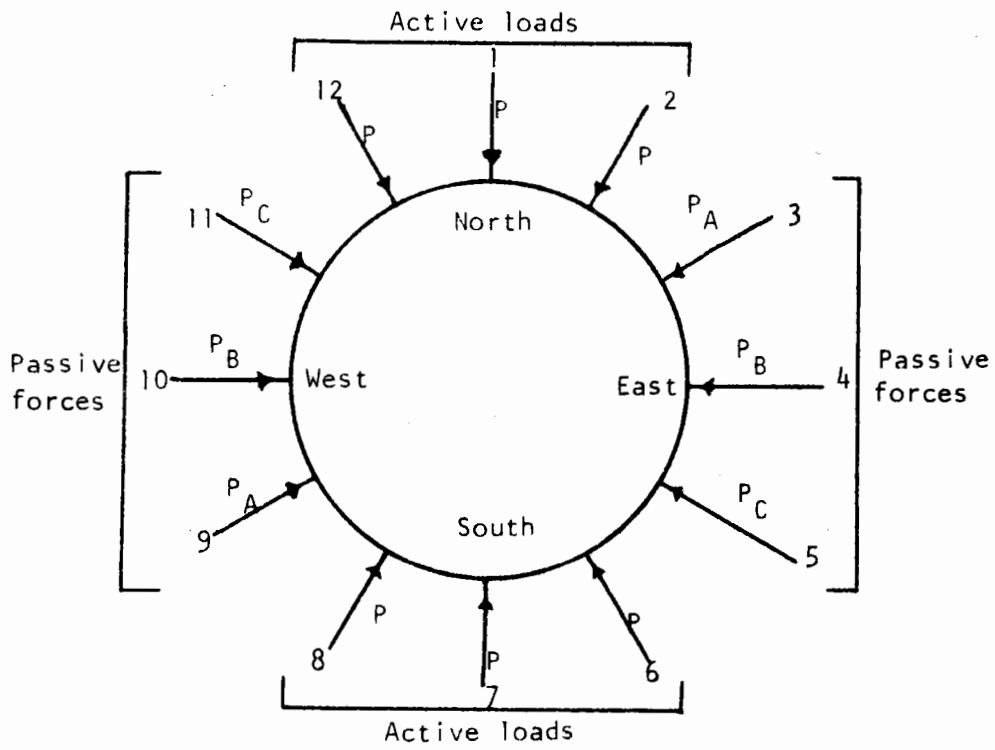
LOADING OF THE LINER SPECIMEN
